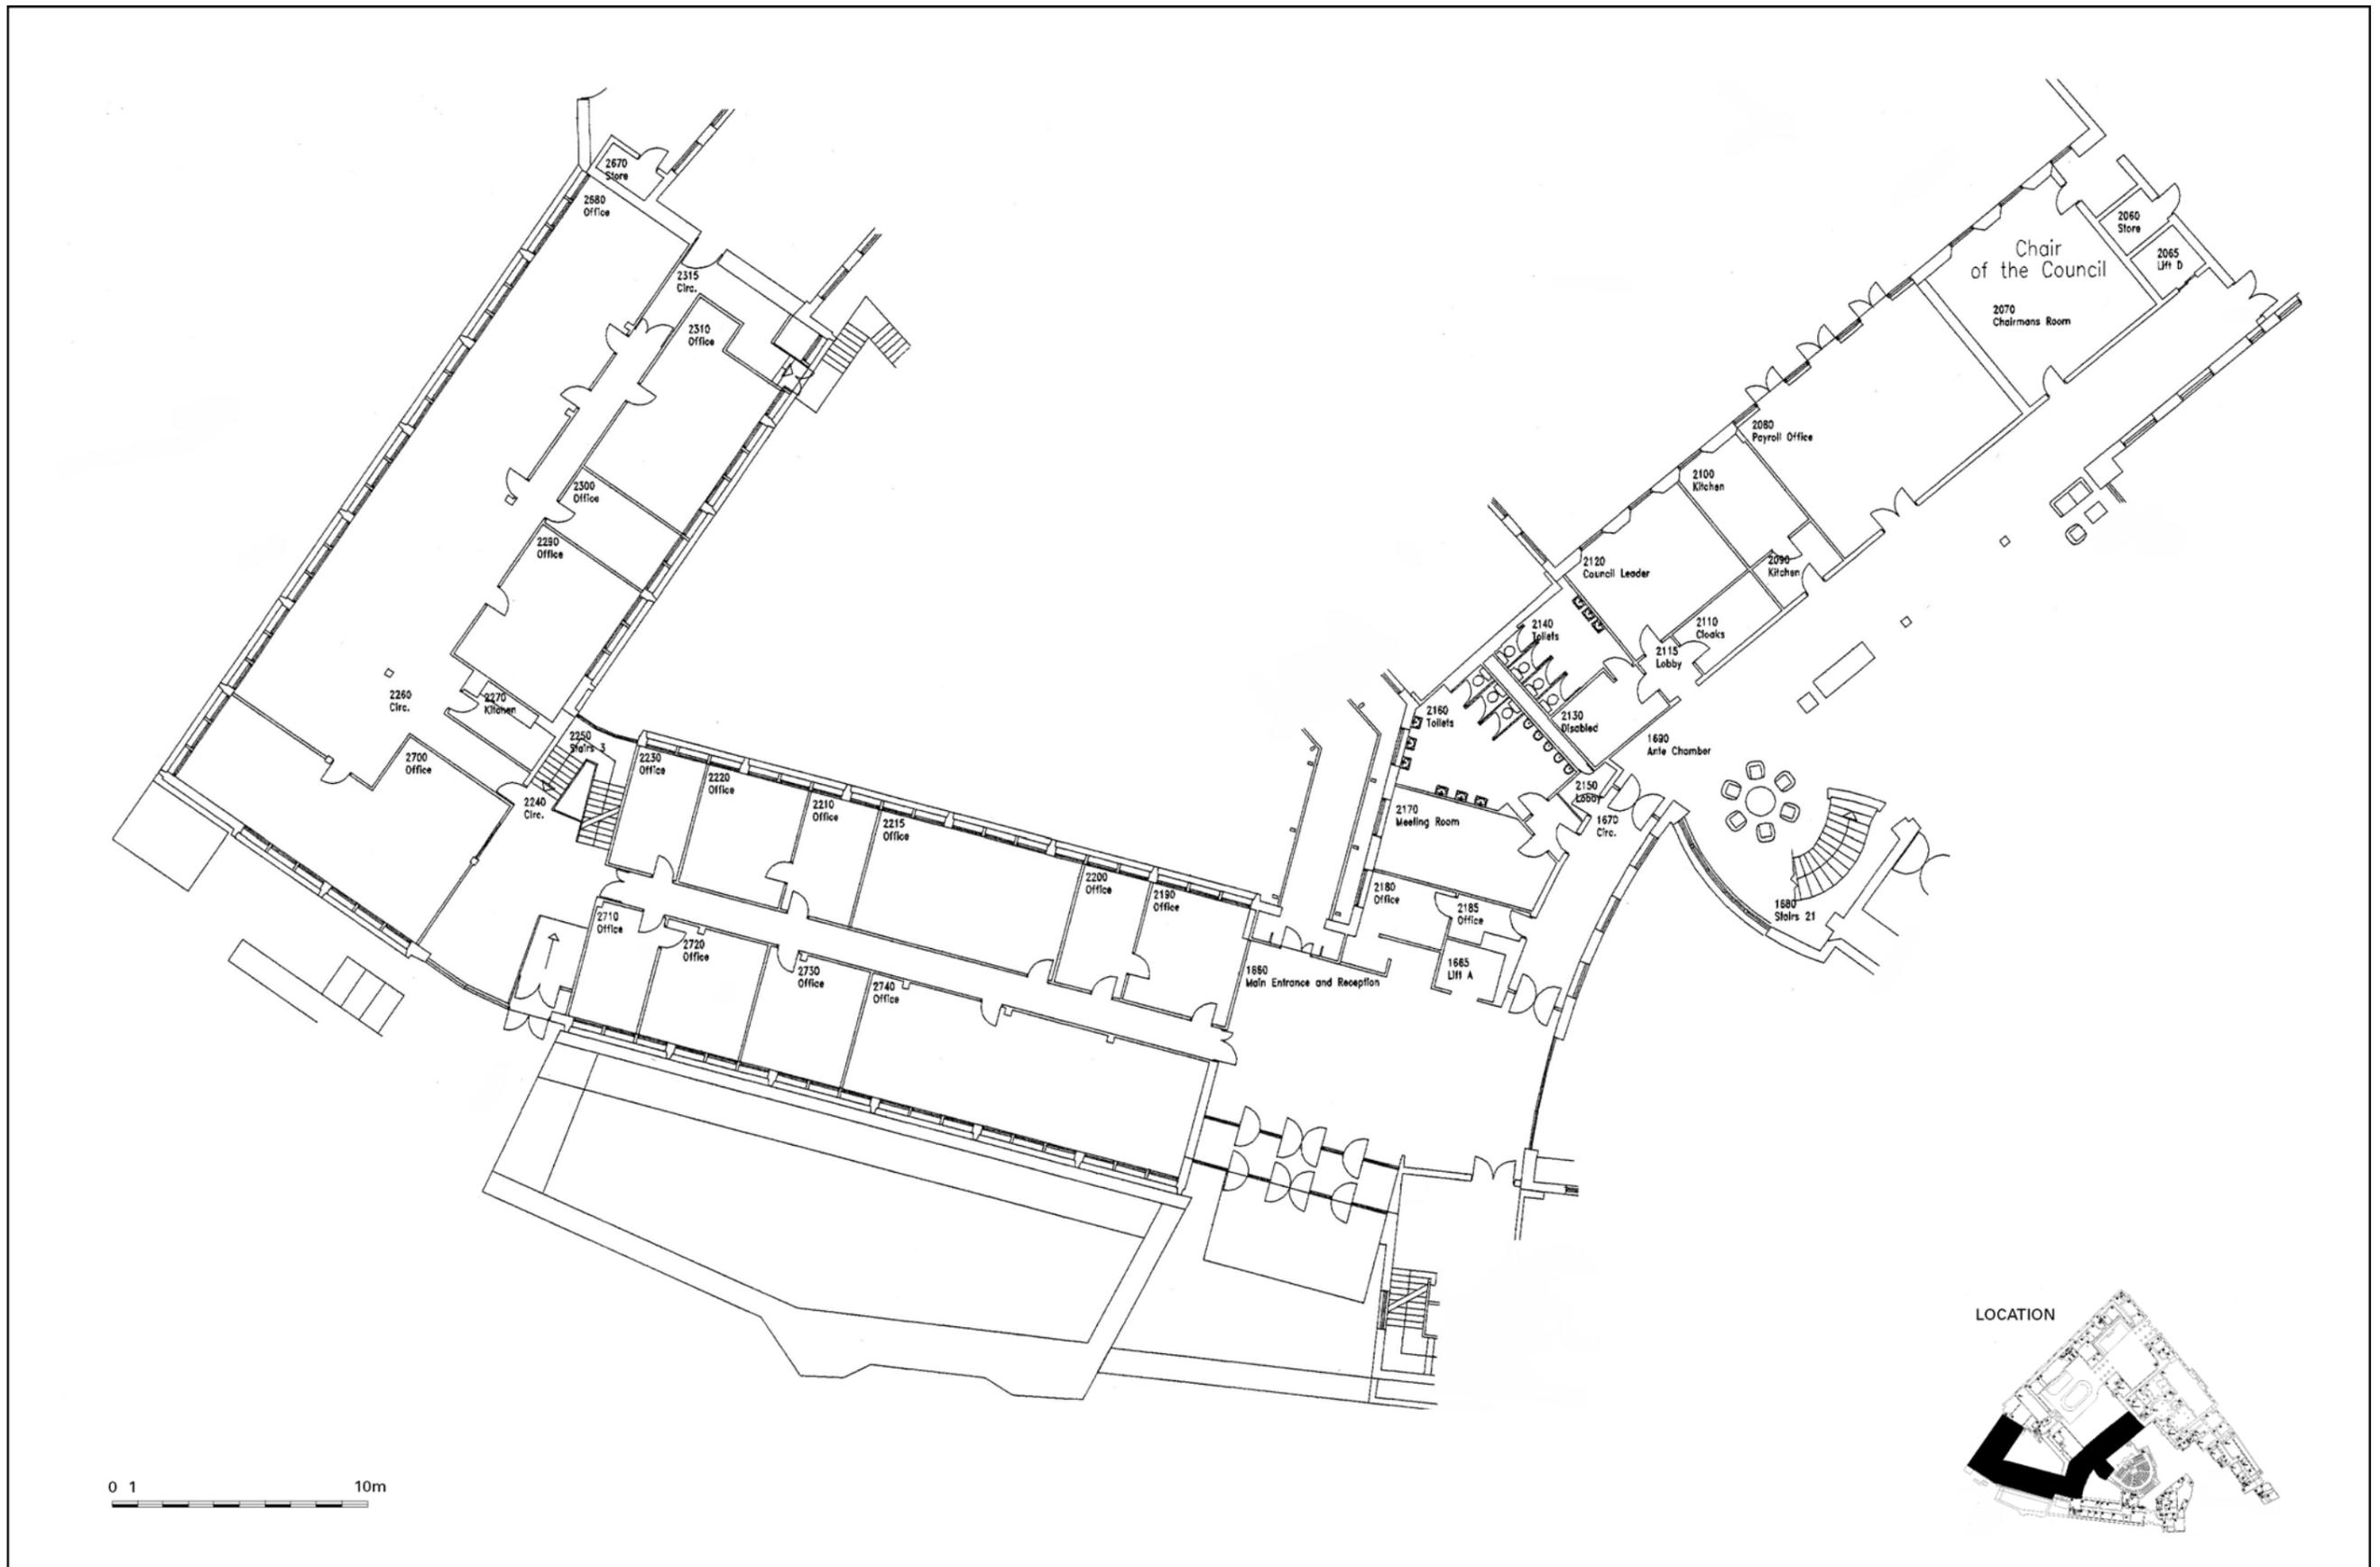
1966 Committee Rooms, Ante-chamber and Offices, ground floor plan
